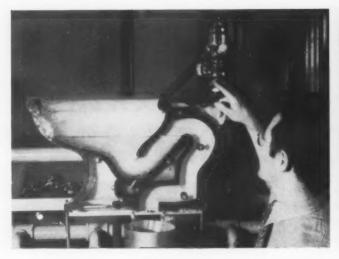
A cross-section view of a toilet bowl equipped with a flush valve which has a vacuum-breaker between the bowl and the valve.
